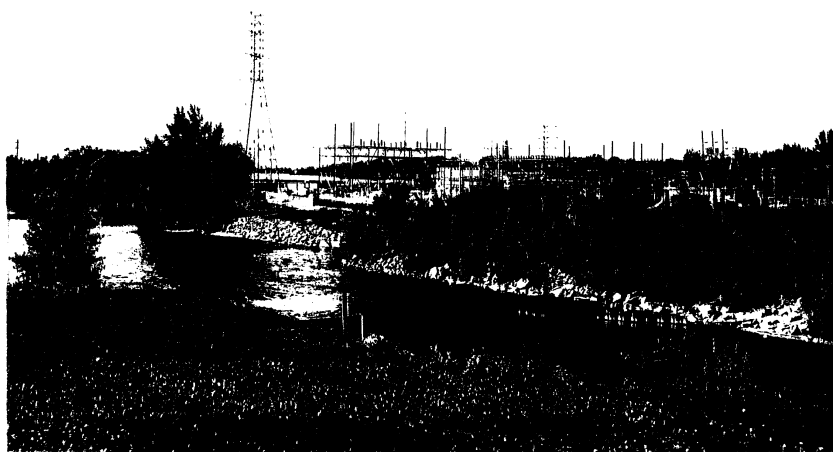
View from Earth Embankment Showing Proposed Tailrace Area. Note NSP Substation, Riprap, Sheet Piles and Tailwater Gage.
